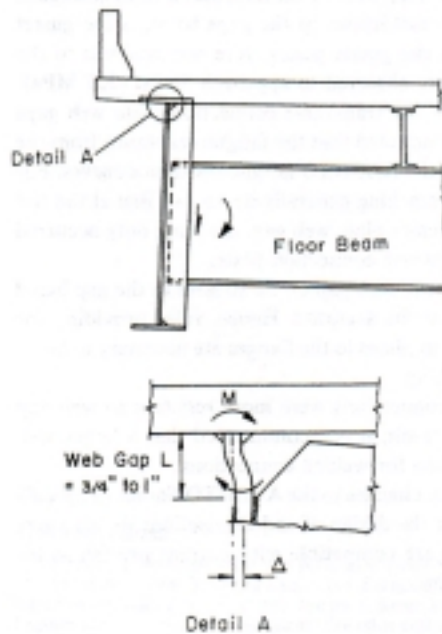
Example of Out-of-plane distortion in web gap at end of floor beam transverse connection plate
